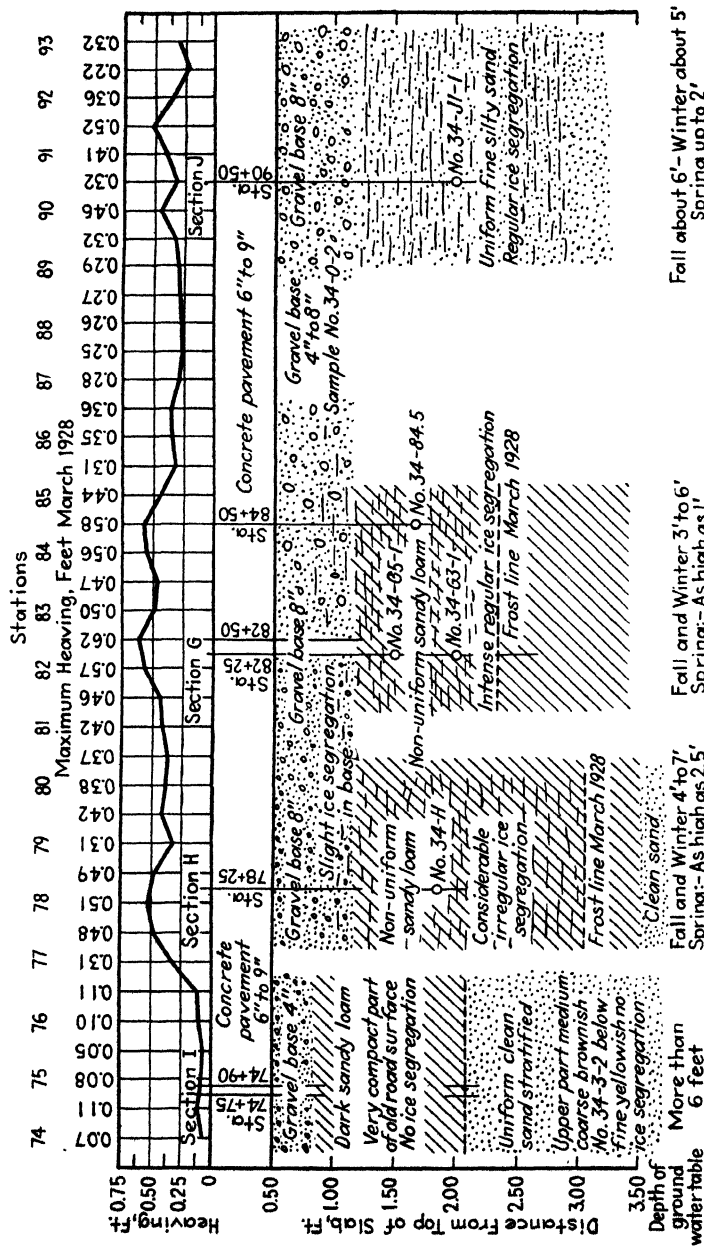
Record of frost heave and soil conditions along concrete pavement section in New Hampshire.
